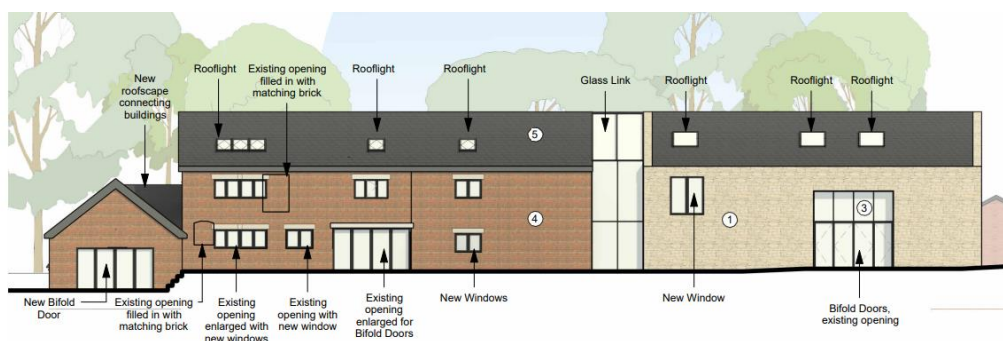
Plot 1 Proposed Rear (N) Elevation
